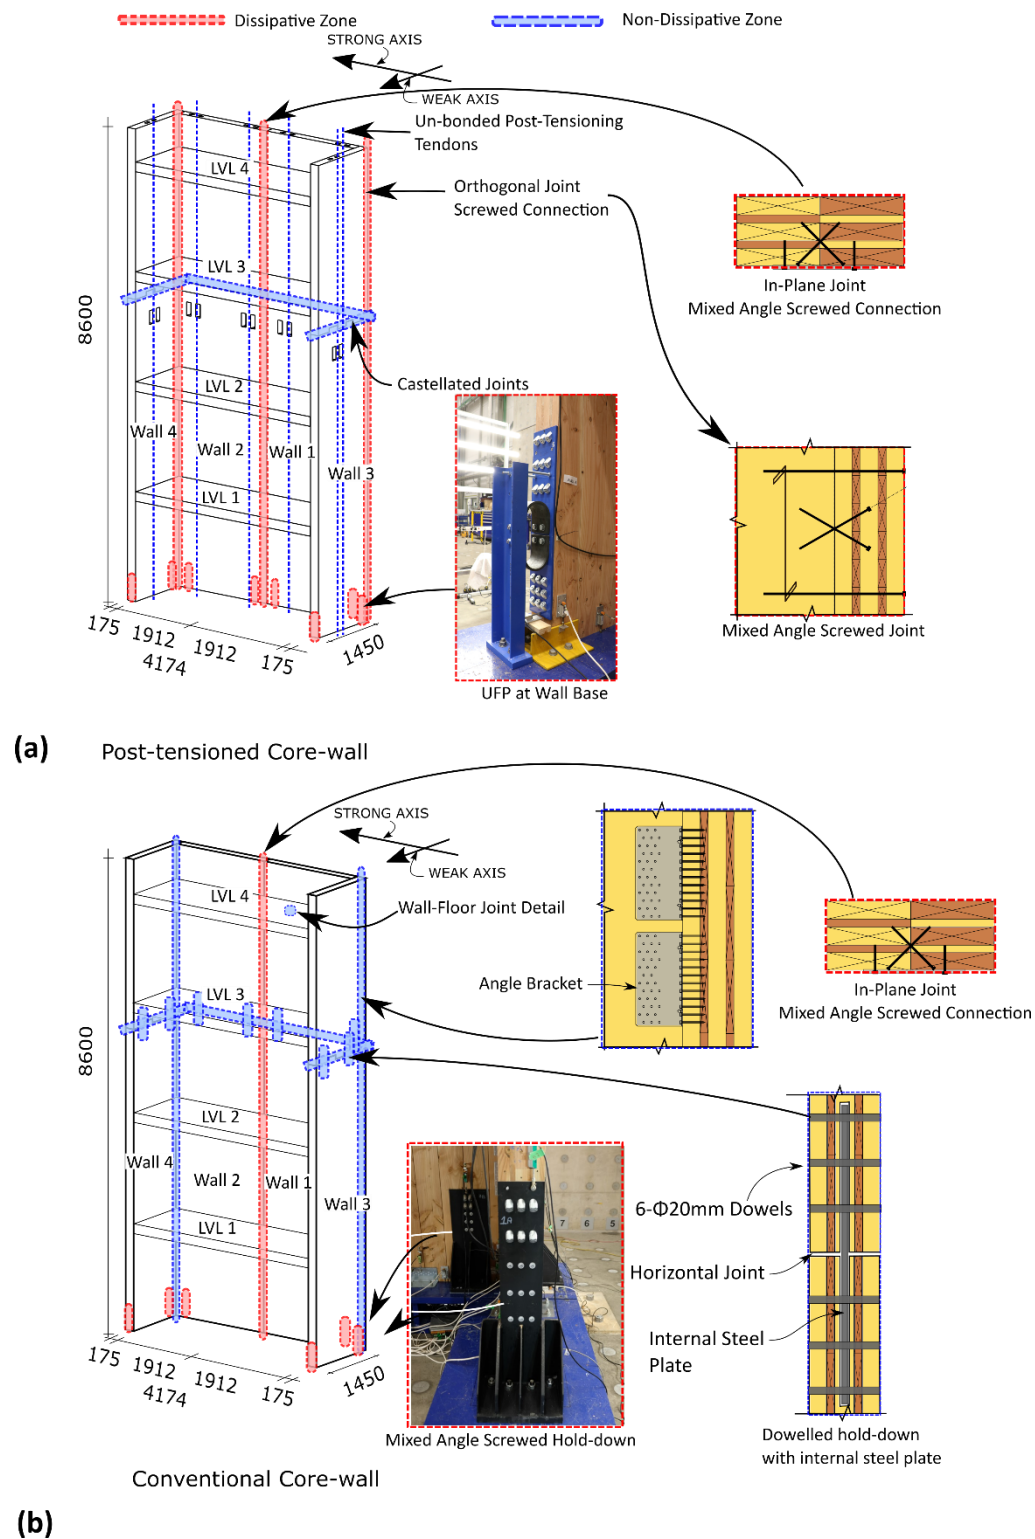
Hierarchy of strength highlighting dissipative (in red) and non-dissipative (in blue) zones for (a) post-tensioned core-wall system, and (b) conventional core-wall system
